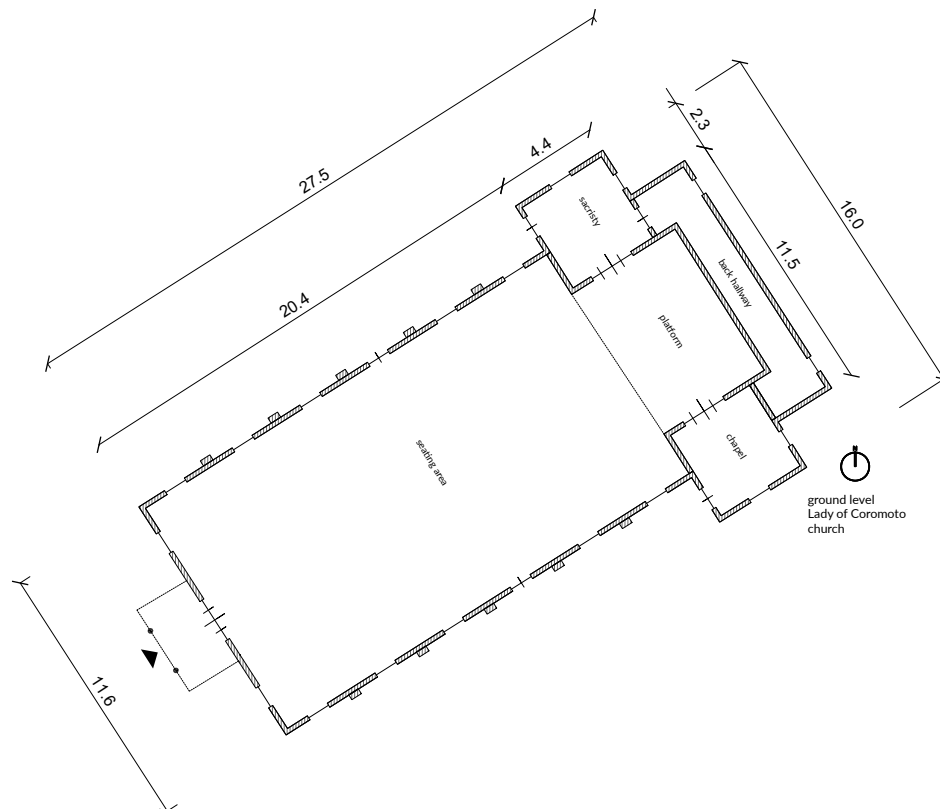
Sketch floorplan of Lady of Coromoto church (own work)
